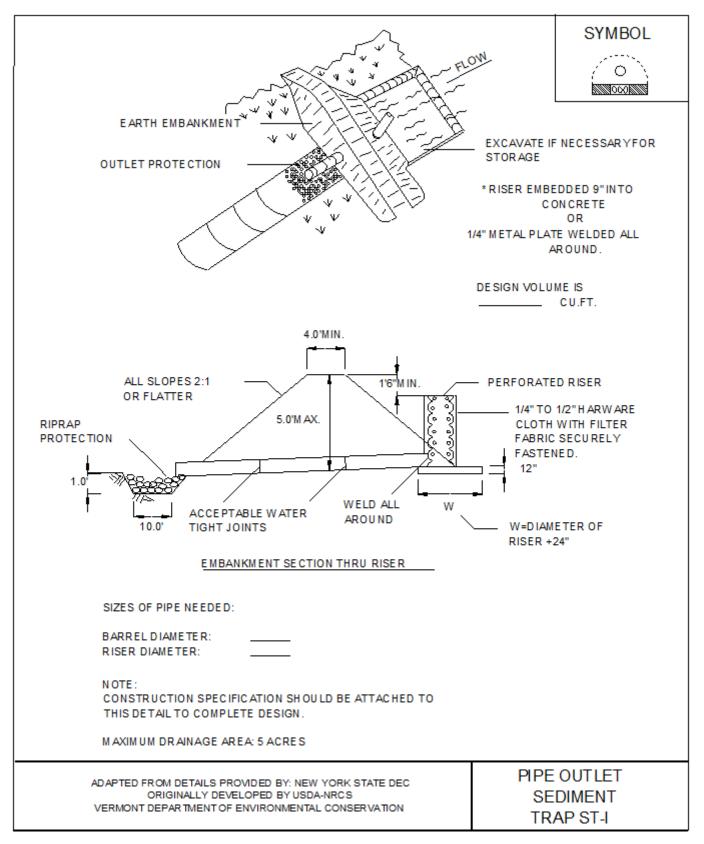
Pipe Outlet Sediment Trap ST-1
